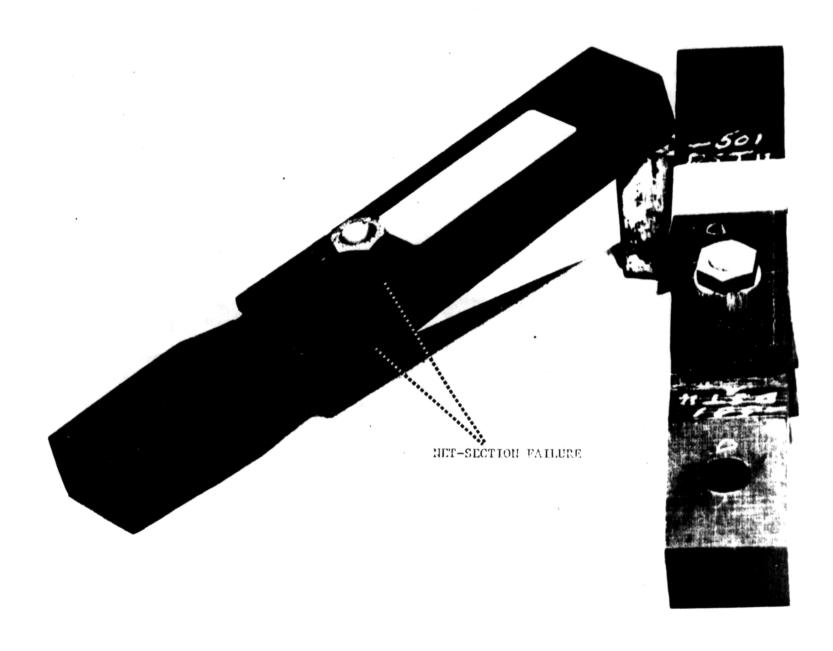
DOUBLE SHEAR TENSION TESTS - NET-SECTION FAILURES
